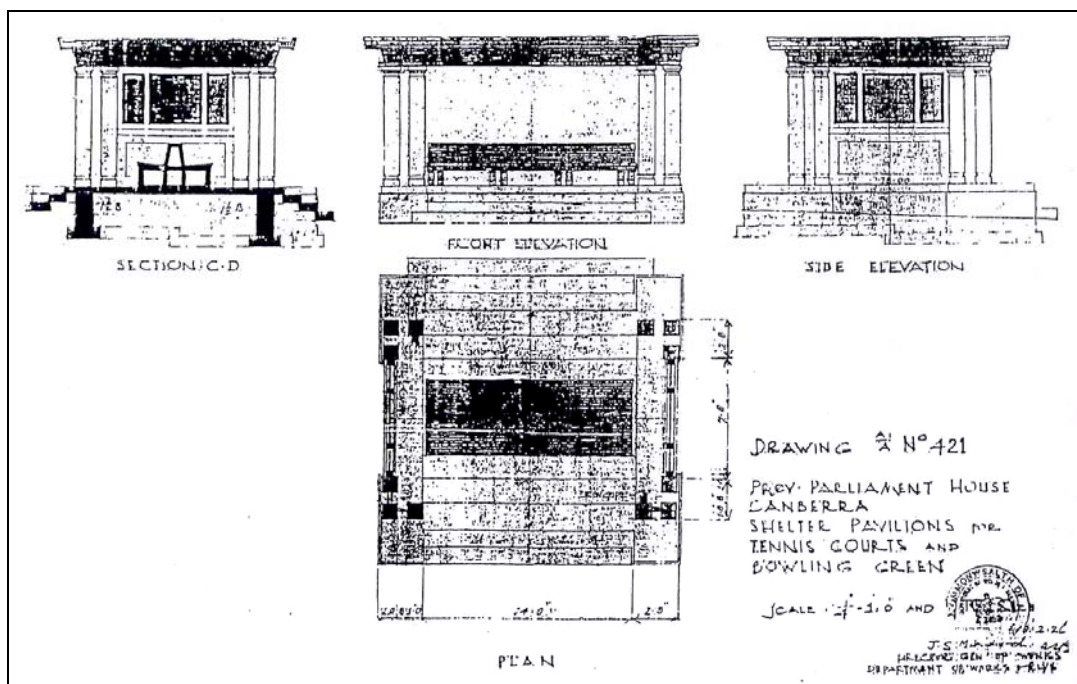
Plans for Shelter pavilions designed by Murdock but not constructed (Source: National Archives of Australia, Department of Works Drawing No. 421, 1926)
